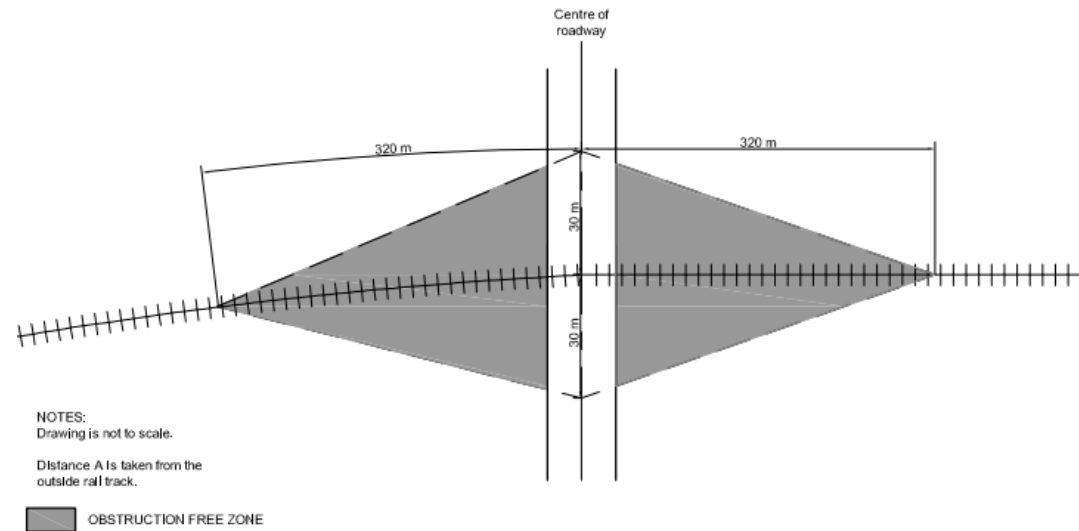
Approach sight triangles for level crossings with “Give Way” signs
